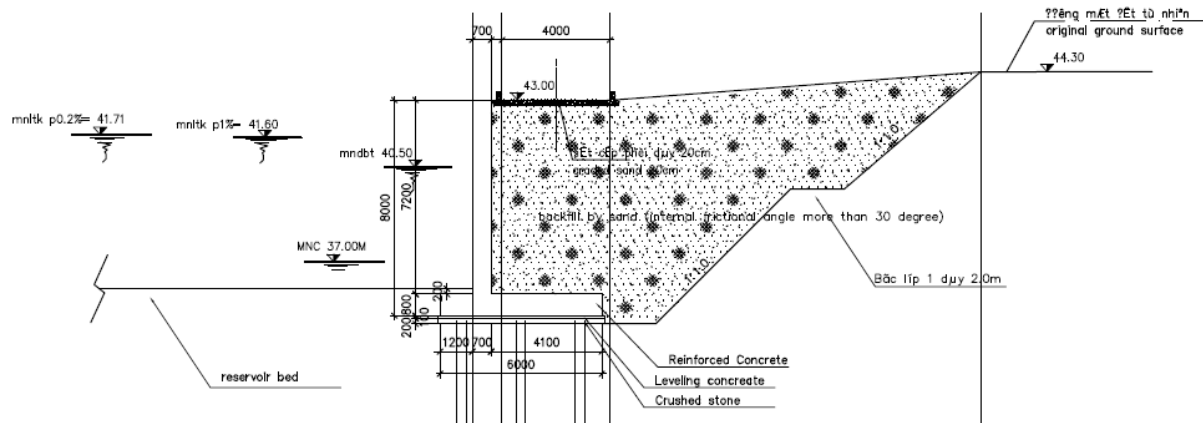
Cross Section of Concrete Retaining Wall
